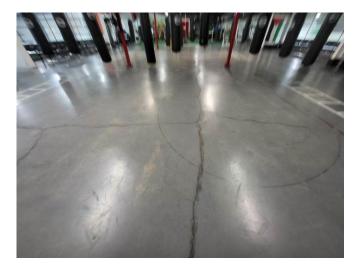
Cracking in the 2nd Floor Boxing Gym Slab
